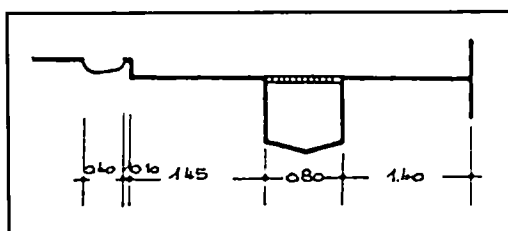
Proper placing of slot beams near the wall (NORDBØ 1962 p. 195).
